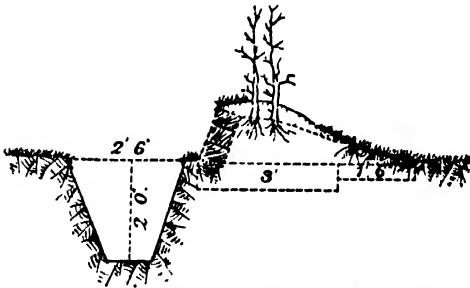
Section of Ditch and Bank with newly planted Hedge
